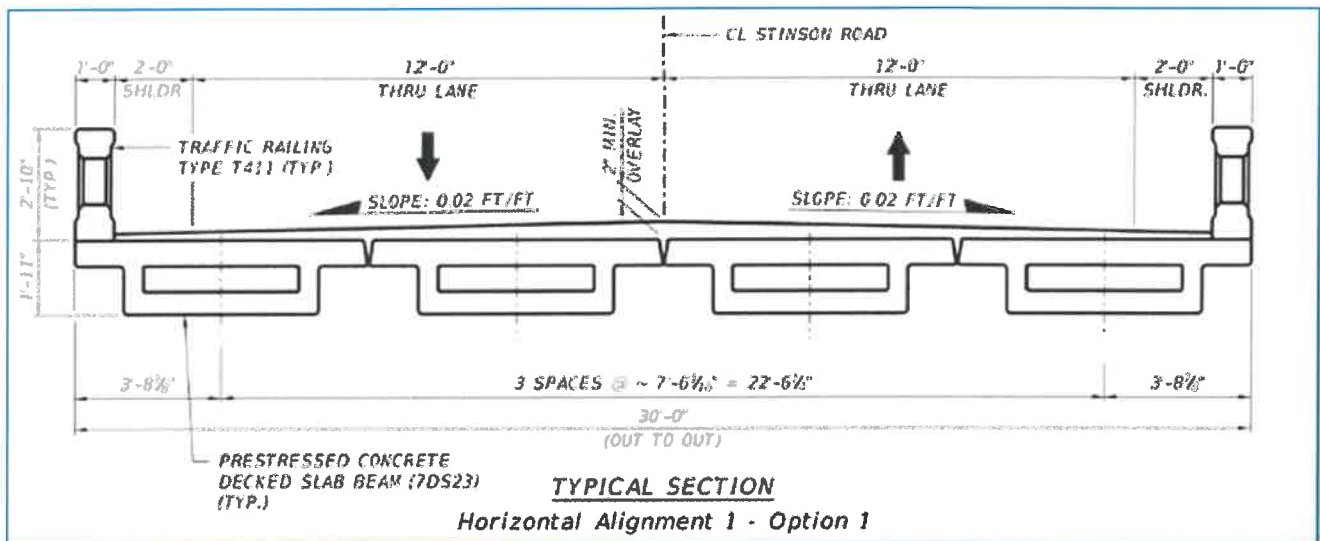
TxDOT Prestressed Concrete Decked Slab Beams (7SB23) Typical Section
